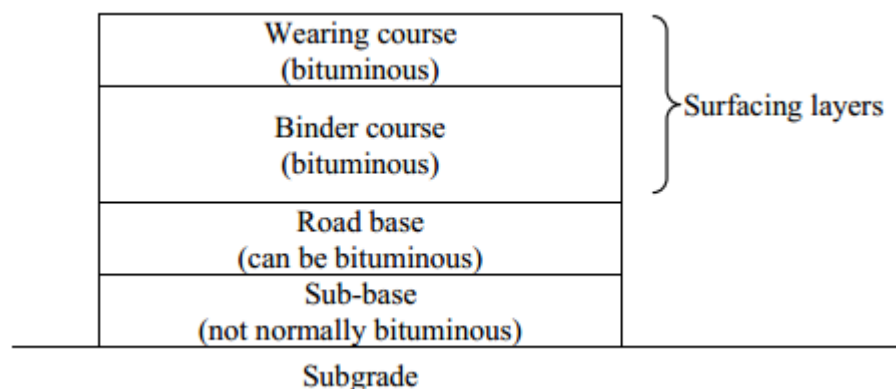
1 Typical cross section of flexible pavement(Source: ERA manual,2013)
